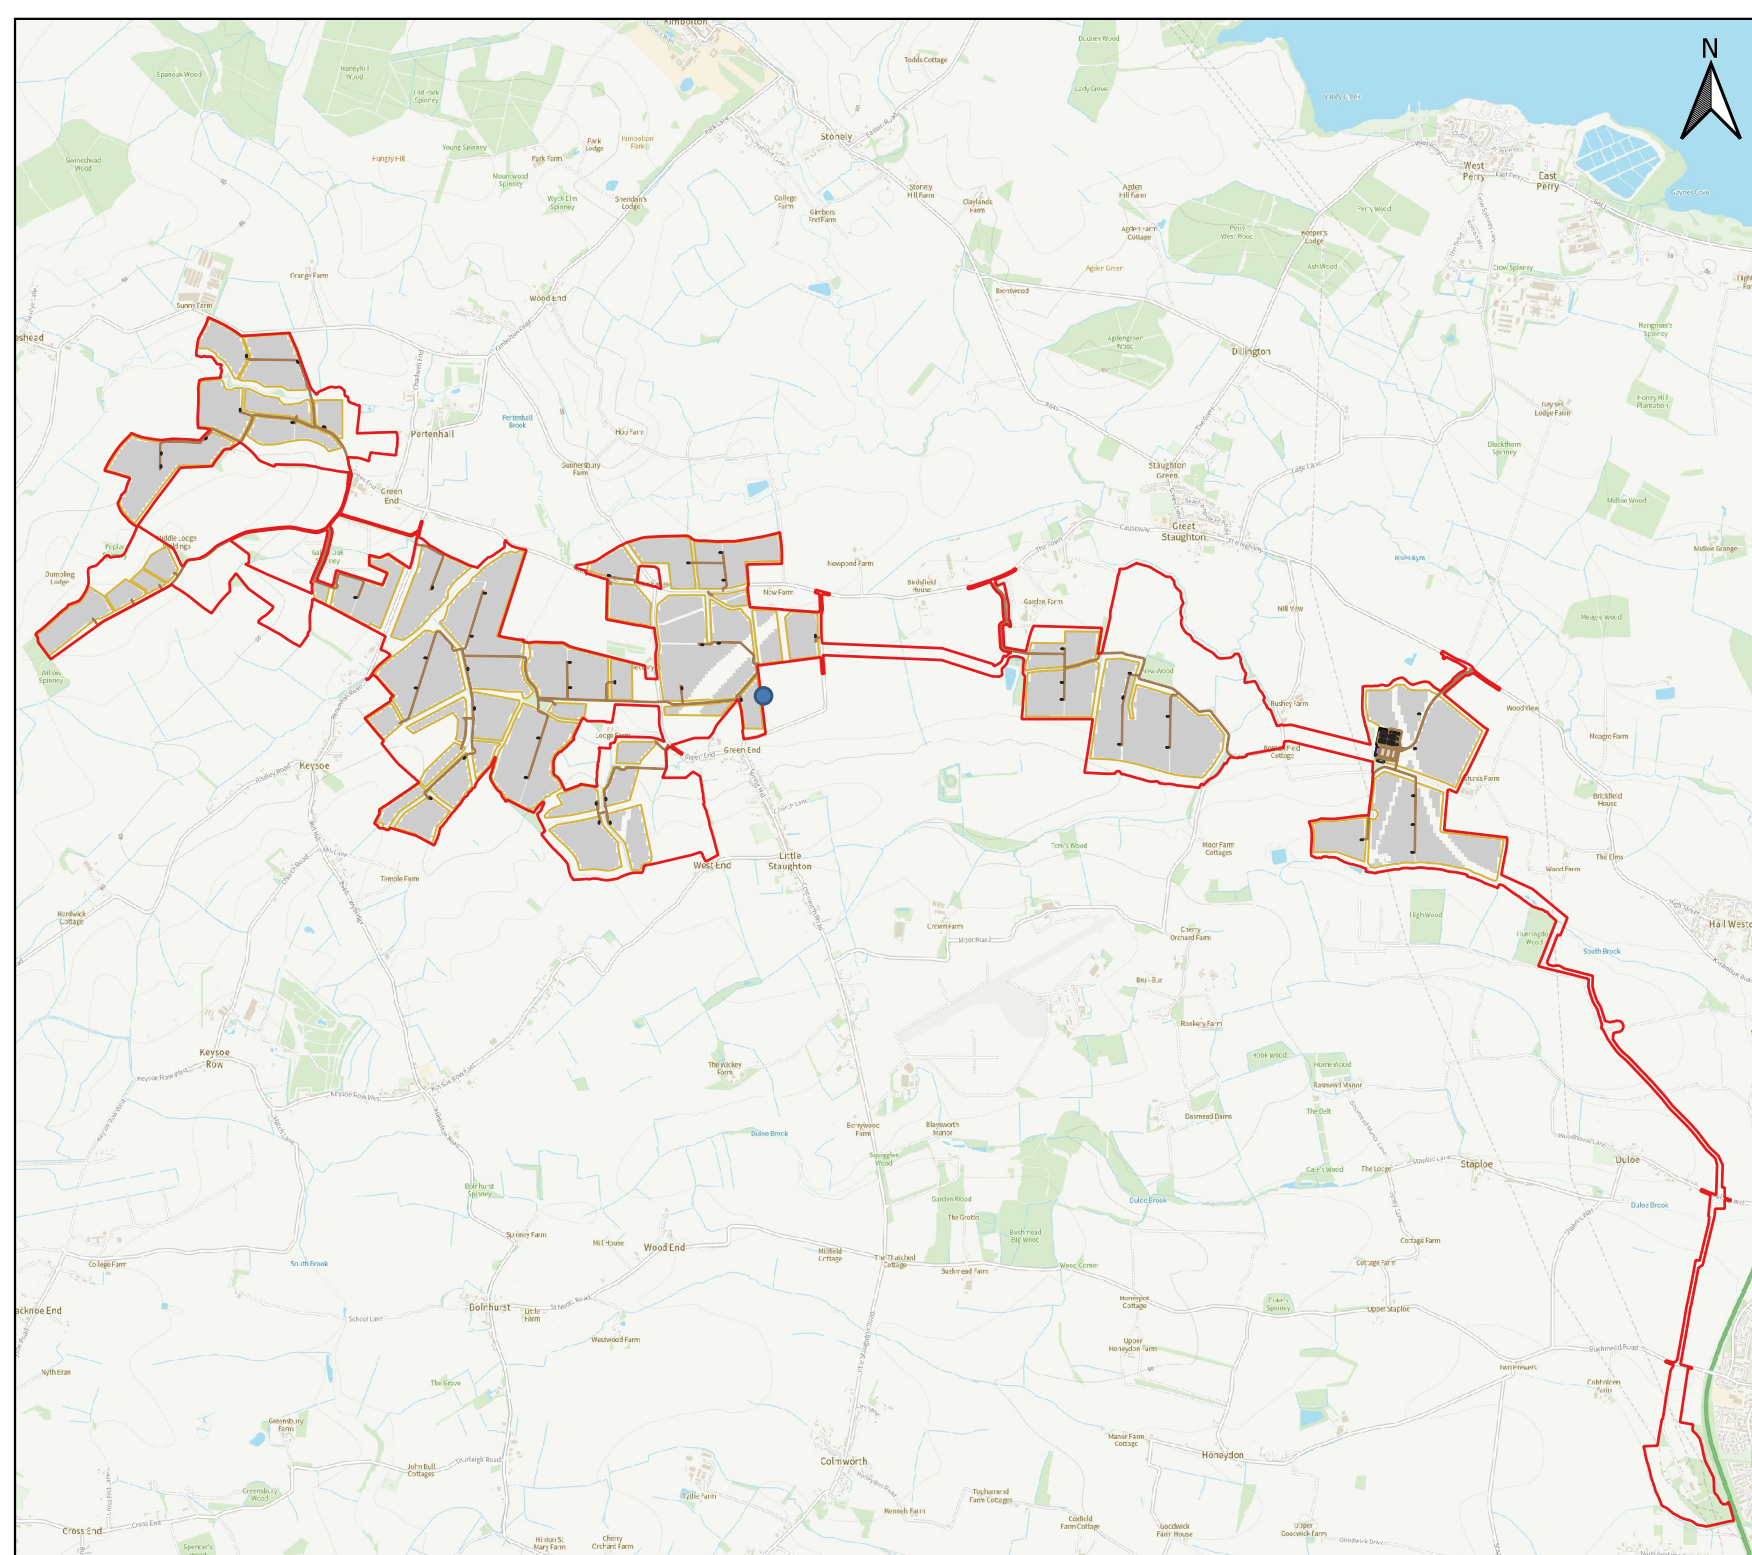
INDICATIVE DRAINAGE LAYOUT
